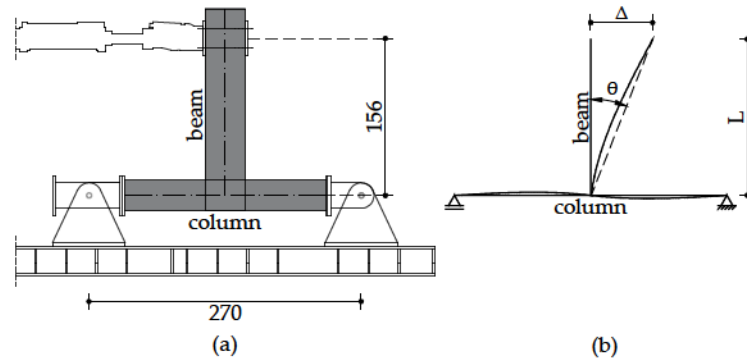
Test layout with actual dimensions in cm (a) and related static scheme with deformation of the beam-to-column specimen (b).
